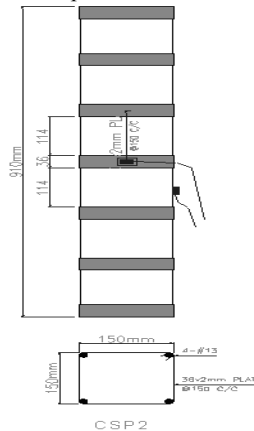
Overall dimension and reinforcement details of test specimen CSP2
